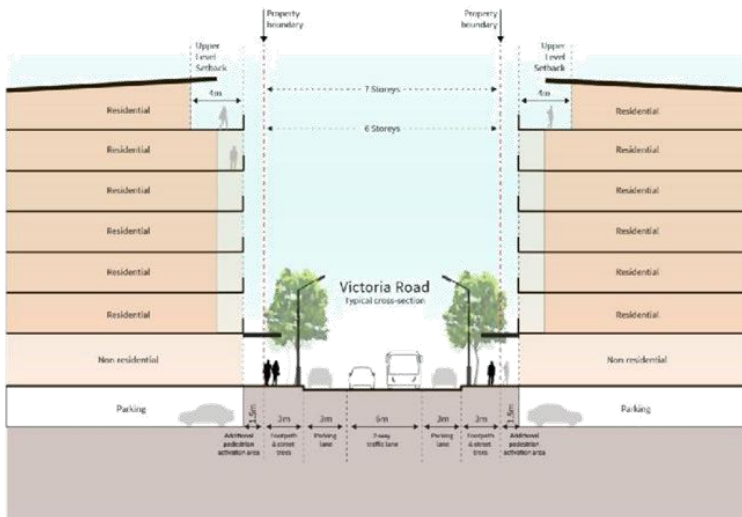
Street section 1 - Victoria Road (B4 Mixed-Use zone)
